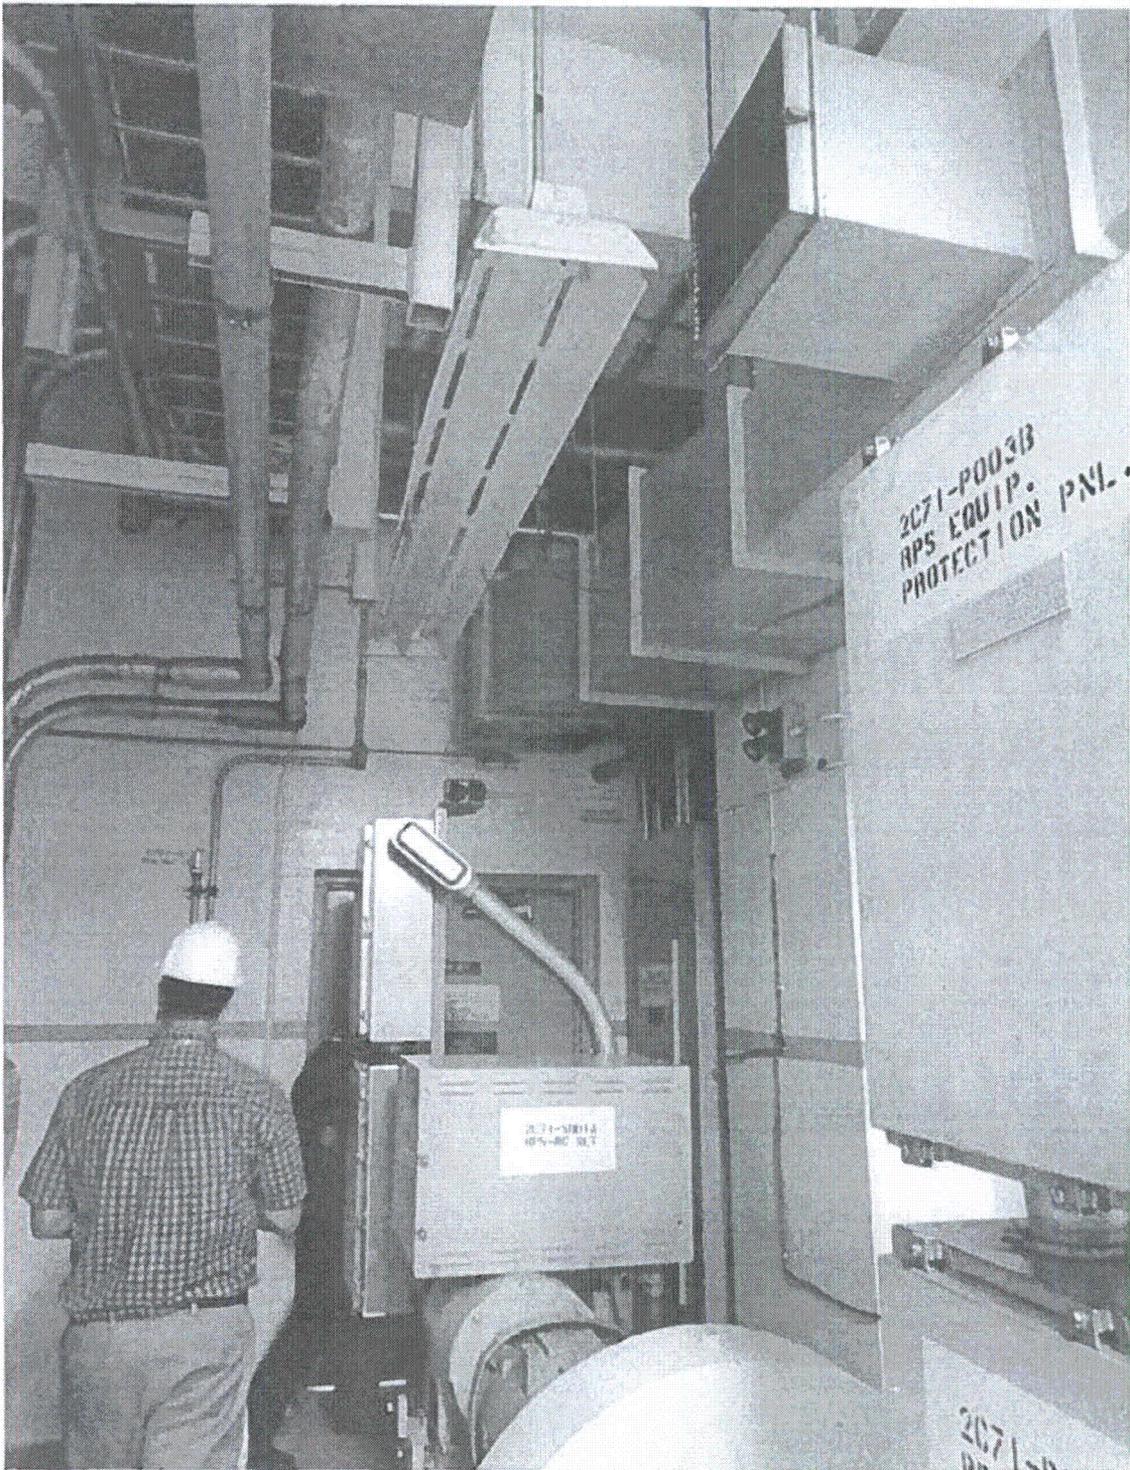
Light Fixture Above Motor Generator (2C71-S001A)
